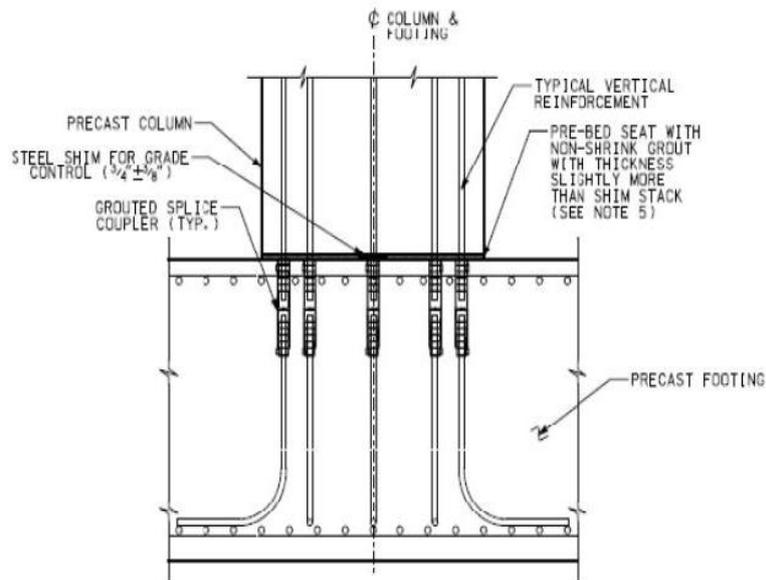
Bar coupler column-to-footing connection detail, courtesy of NCHRP [16].
